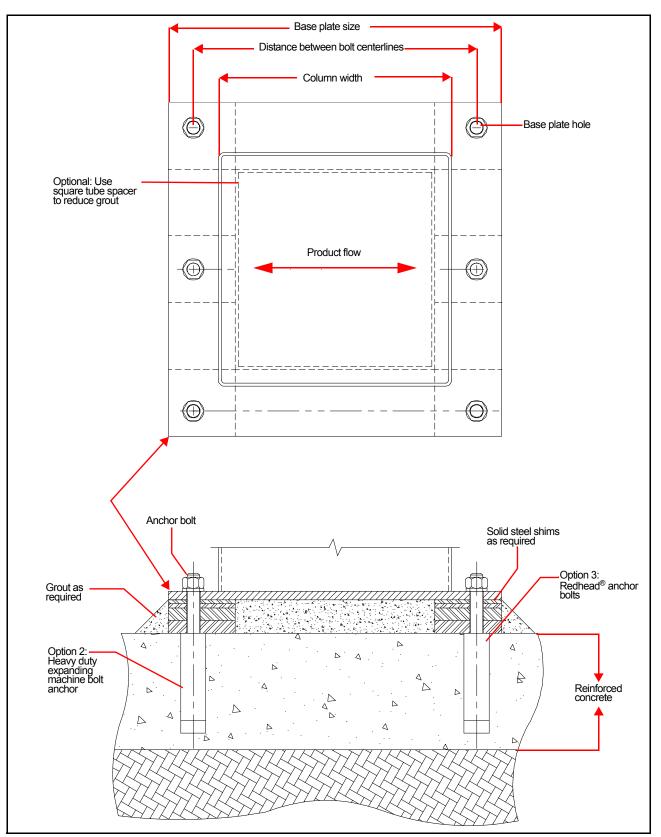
Floor Installation for Columns—Options 2 and 3
